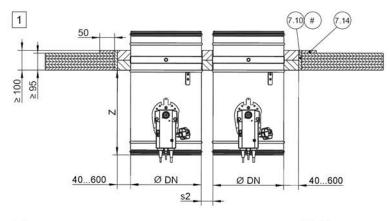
Dry mortarless installation into a timber wall or CLT wall, with a fire batt
